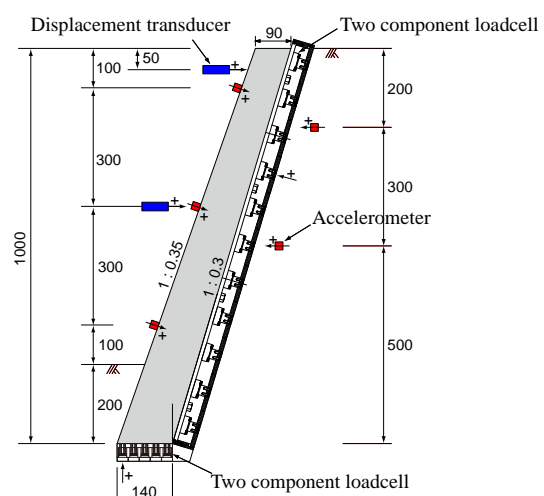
Cross section of leaning type retaining wall model (unit in mm)
